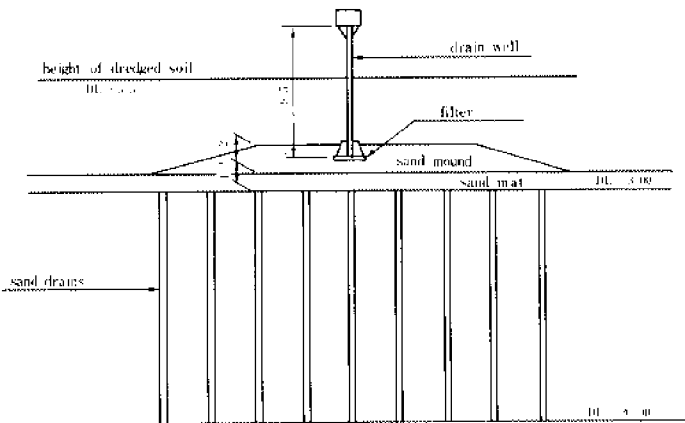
Cross Section of Dewatering with Sand Drains (unit: m)
